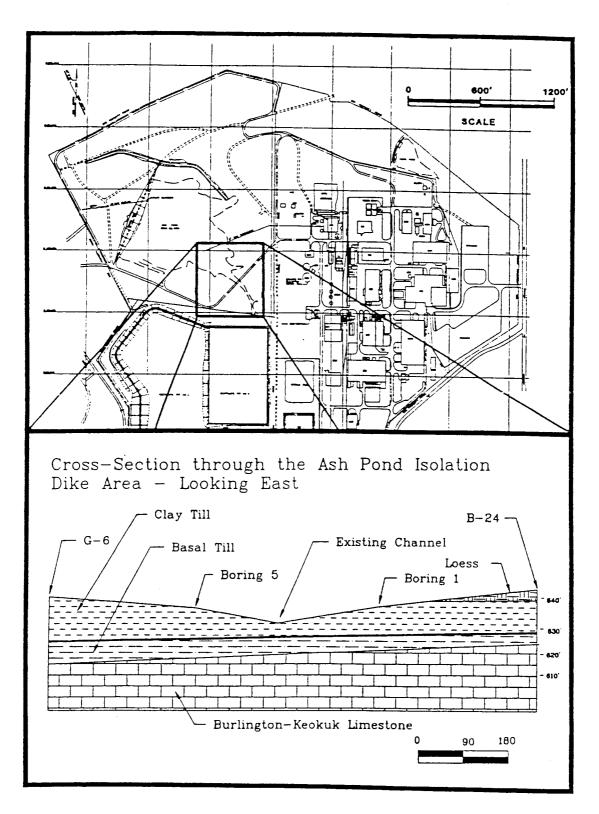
Geologic Cross Section of the Ash Pond Area
